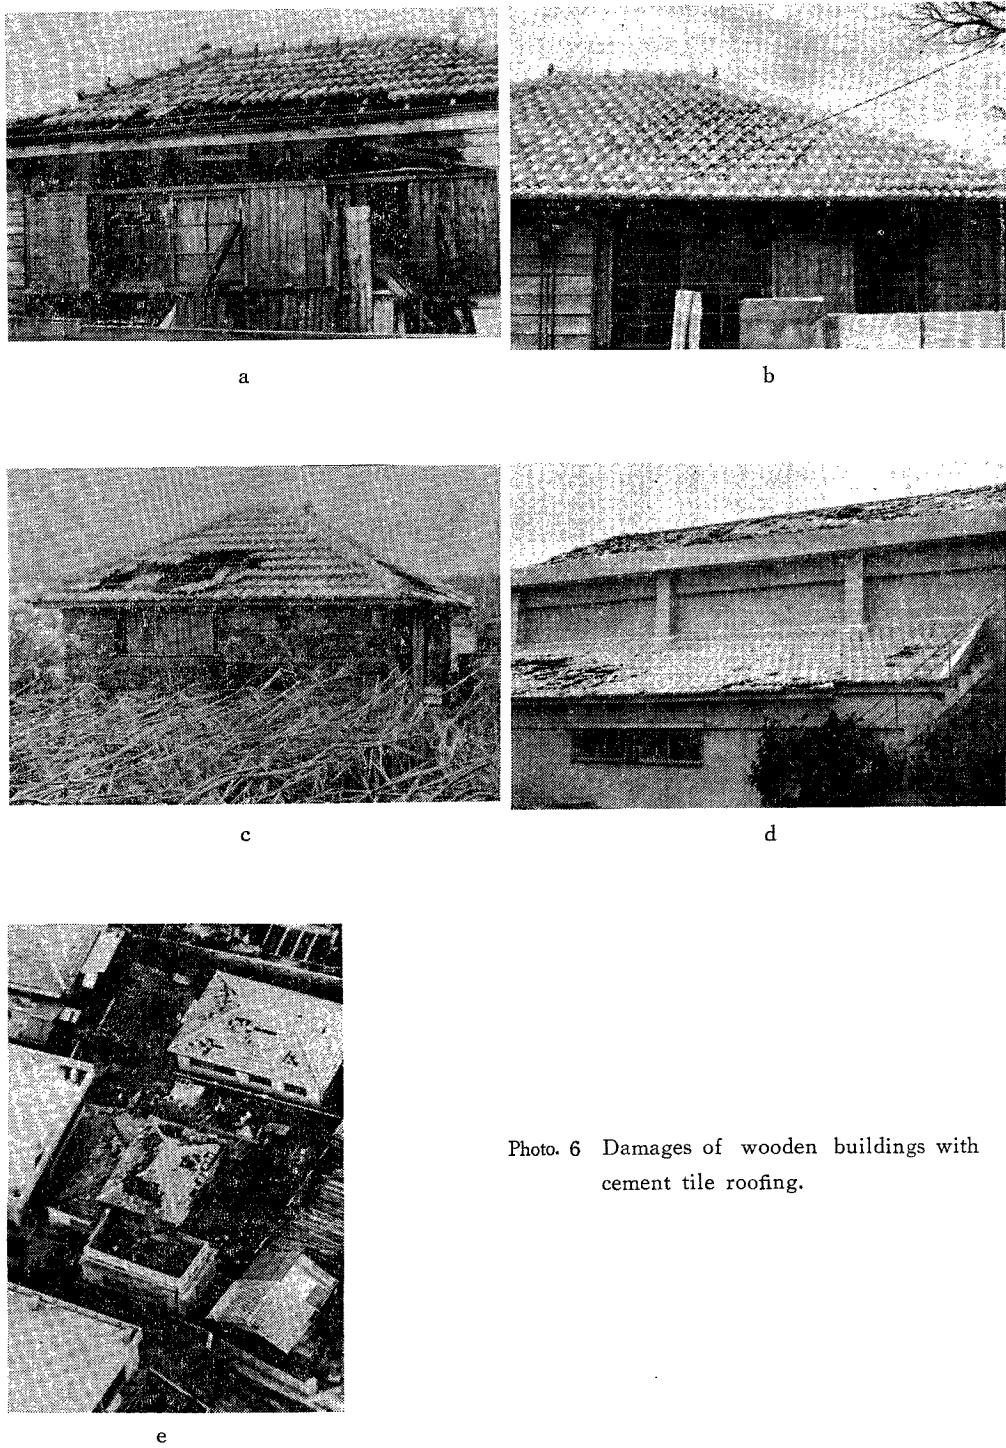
Damages of wooden buildings with cement tile roofing.
